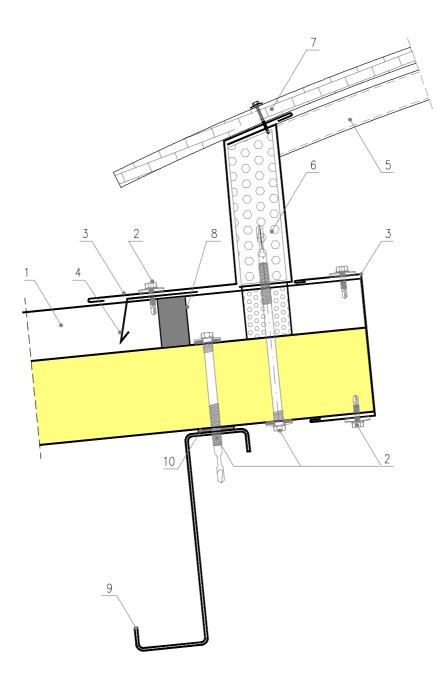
IzoRoof PIR/PIR+; MWF; EPS - ridge skylight
